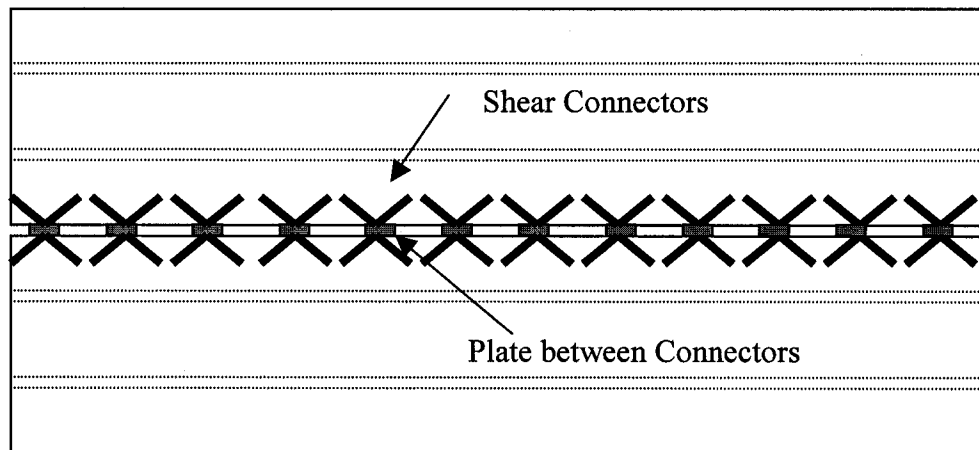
Schematic of Double Tee to Double Tee Connection using Welding Only
